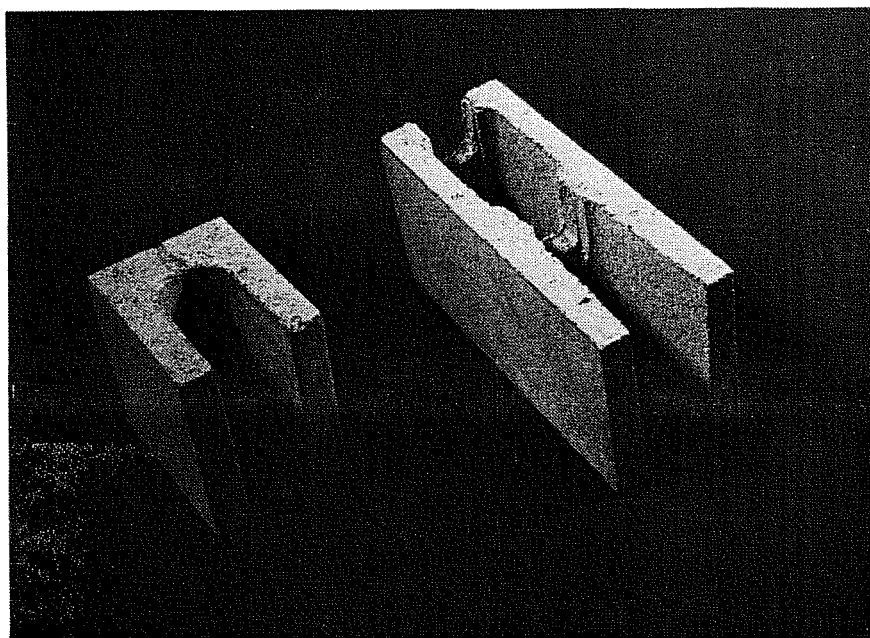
Concrete Masonry Units: Full and Half Unit
